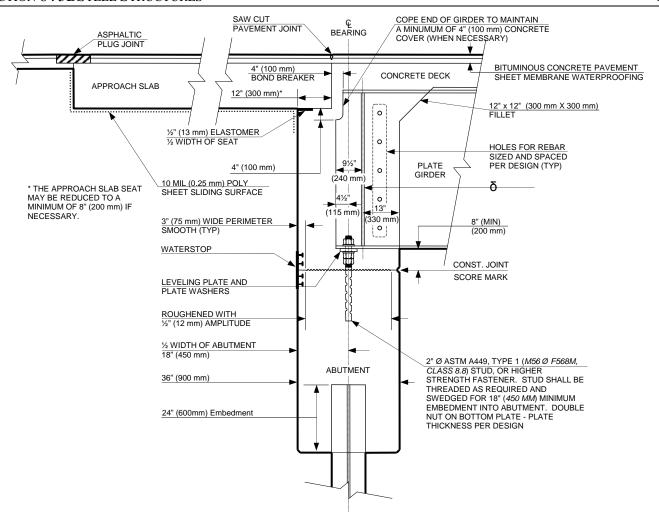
Bridge End Detail Type A (Steel Girder)²
